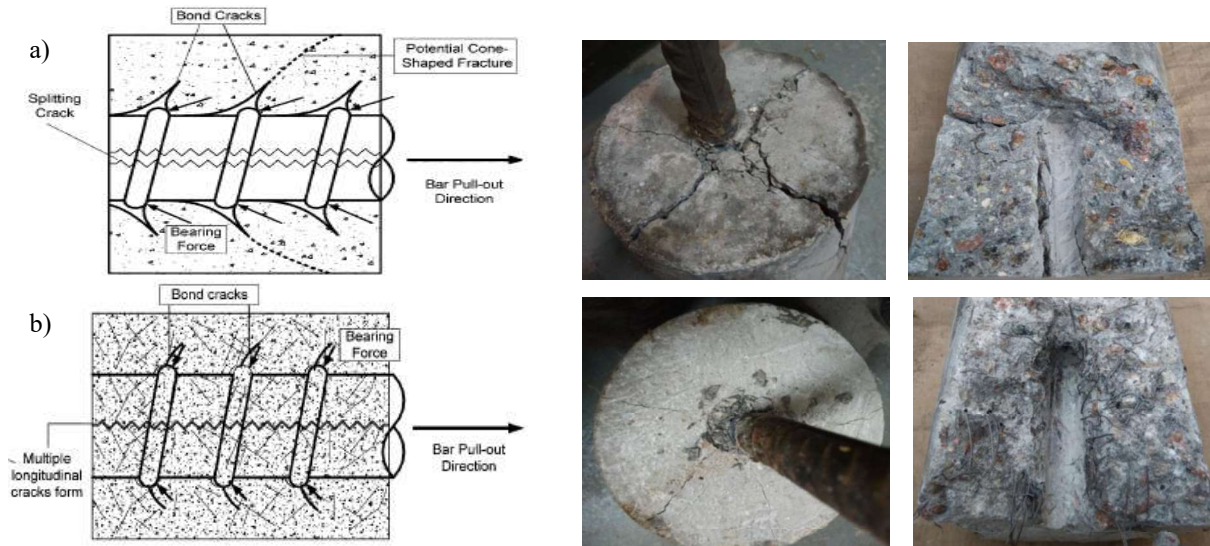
Bond mechanisms of reinforcing bar and crack pattern (illustration from [7]) in: (a) Normal Concrete, C40; and (b) Steel fiber reinforced concrete, SFRC
